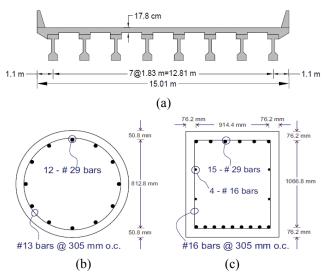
Concrete member reinforcing layout (a) Deck detail (b) Column (c) Bent beam (Bayat *et al.* 2015b)
